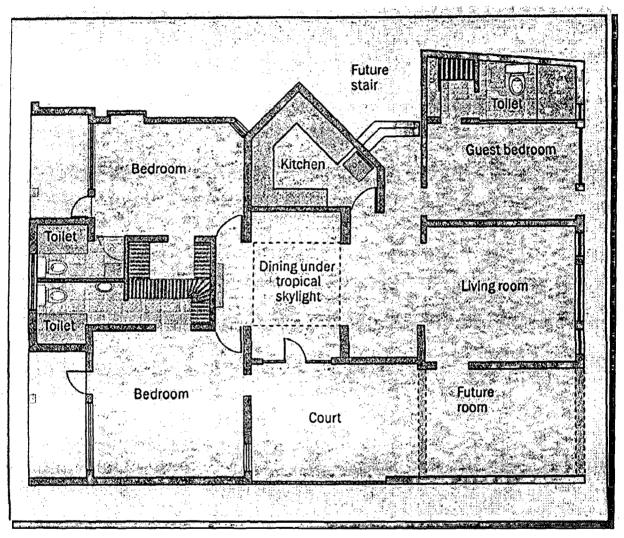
THE PLAN OF SAIGAL HOUSE. INTROVERT PLANNING
